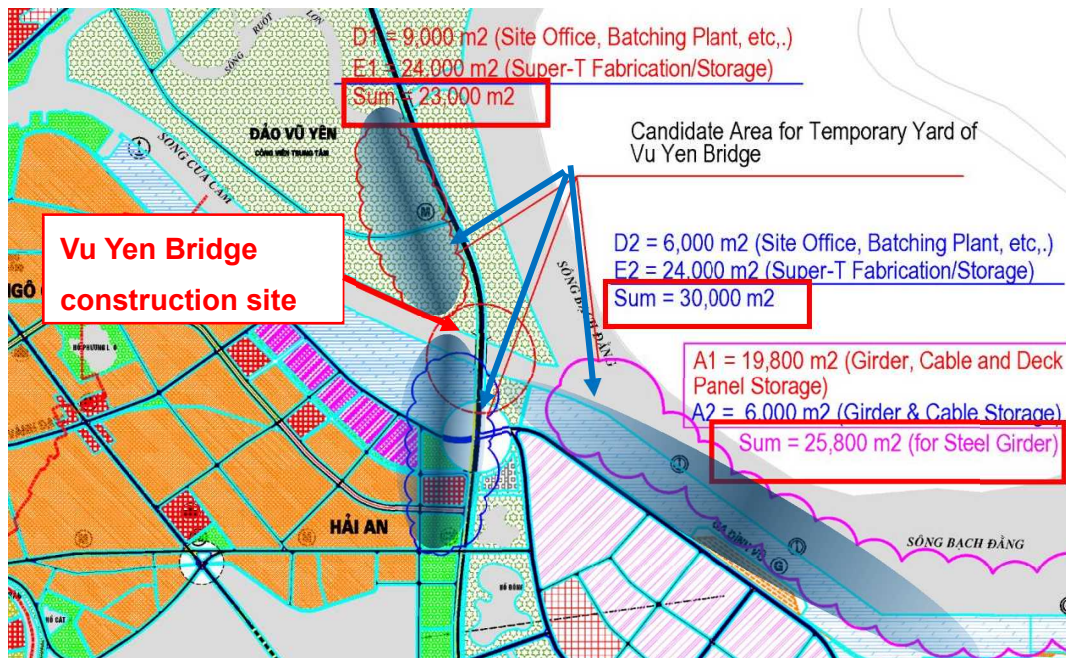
Presumed Location of Temporary Construction Yard
